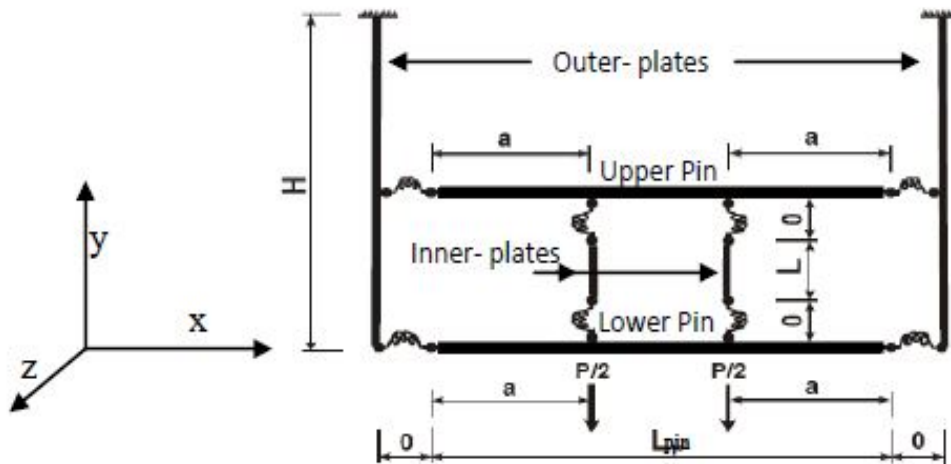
The OpenSees model of double-pin connection with pins placed in-line
